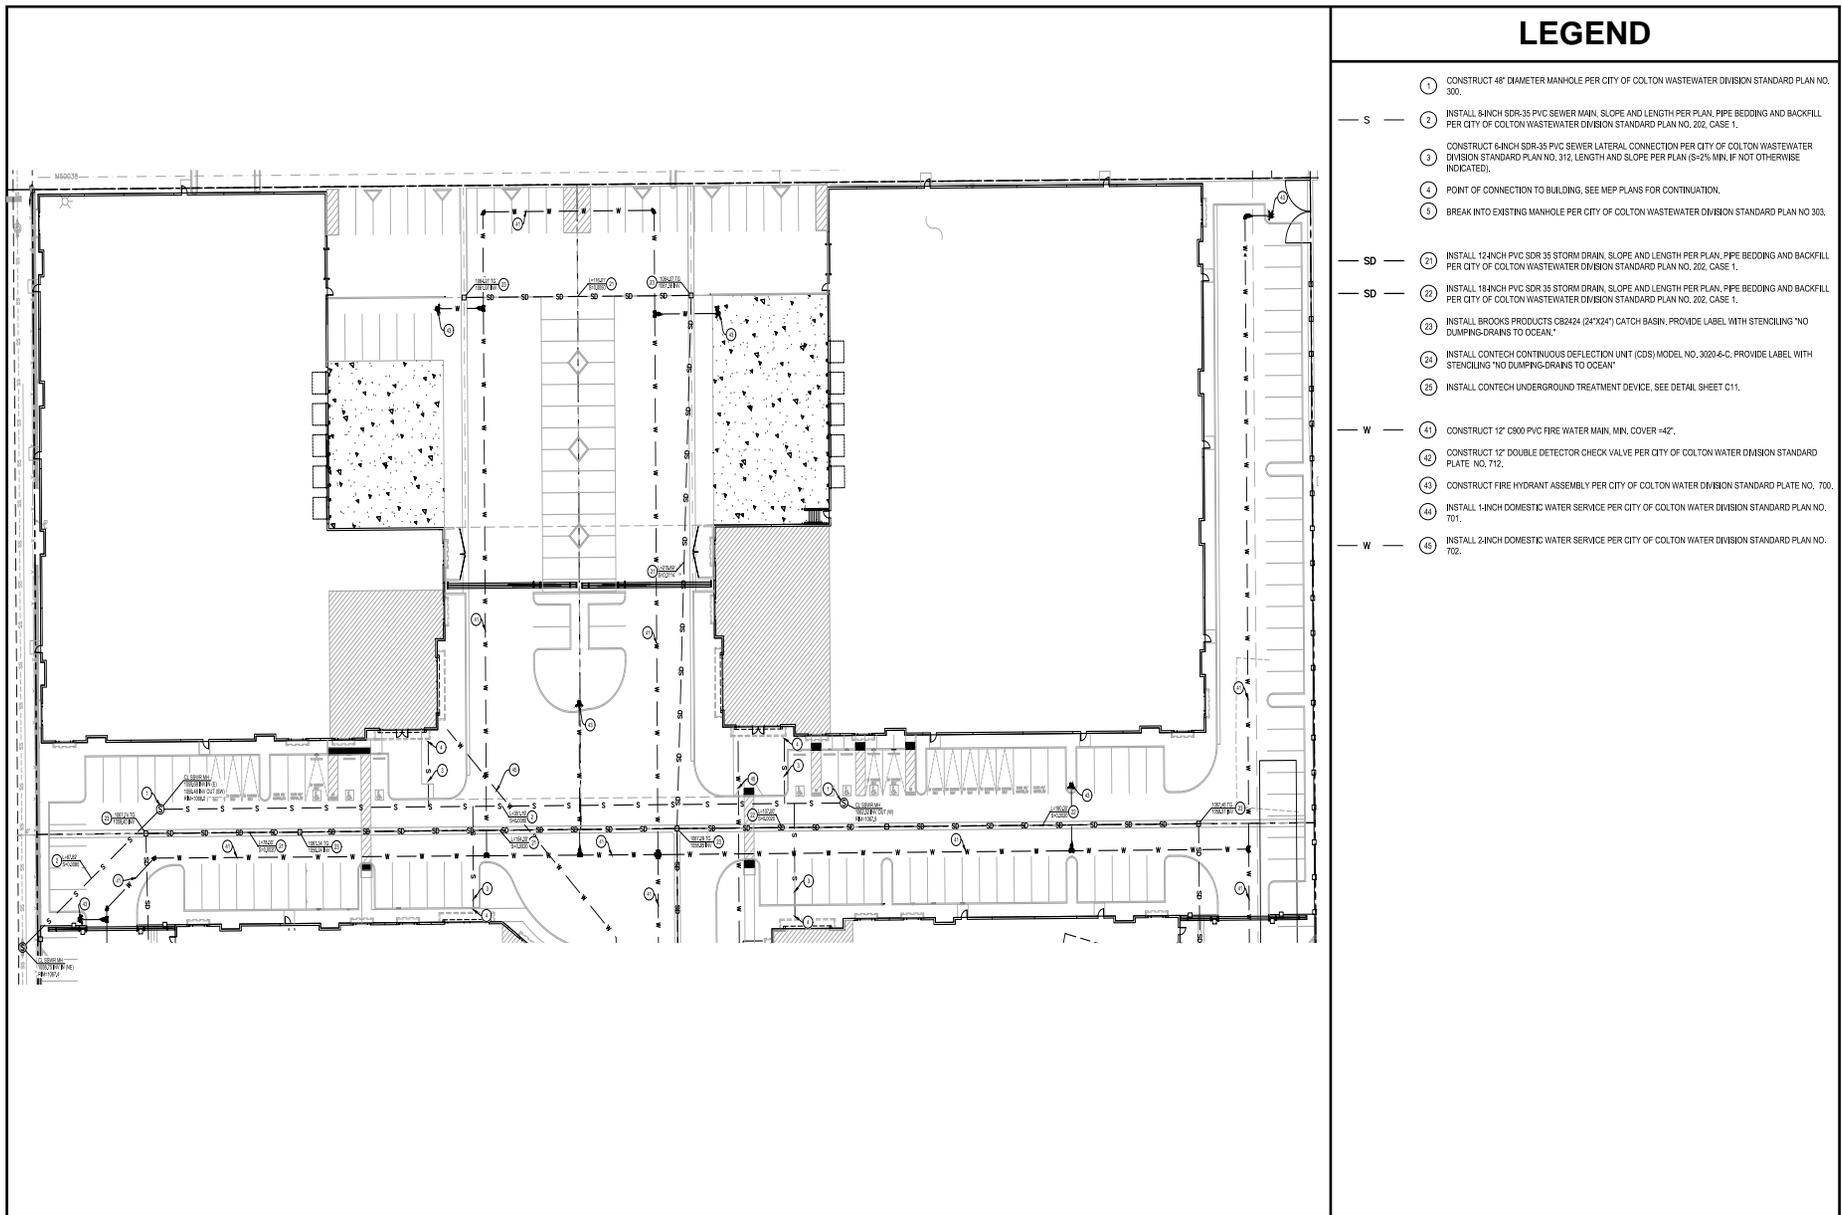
Conceptual Utility Plan - Buildings 1 and 4
